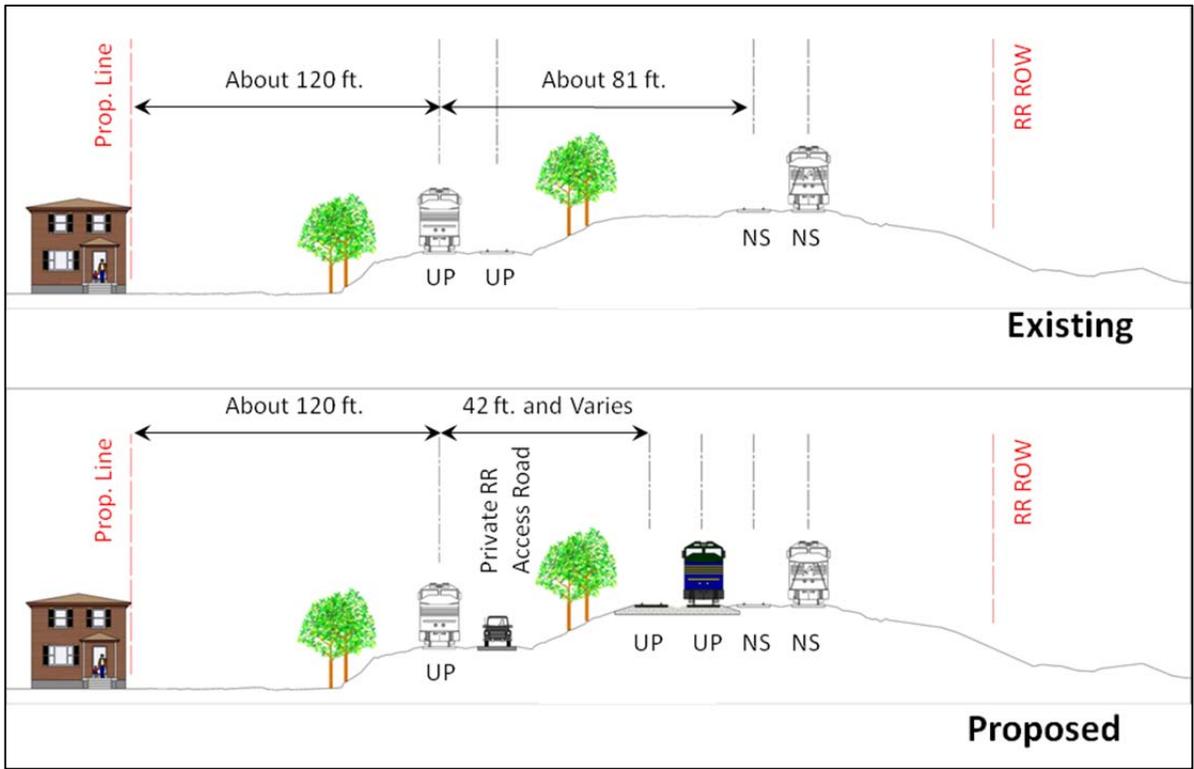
Alternate 80-2 and Existing Conditions, Looking North along UP and NS Tracks near 88th Street
